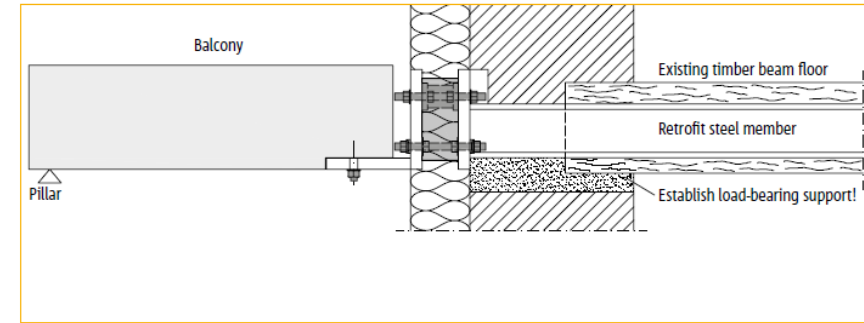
Balcony supported, connected with type KST on timber beam floor (concrete prefabricated component)
